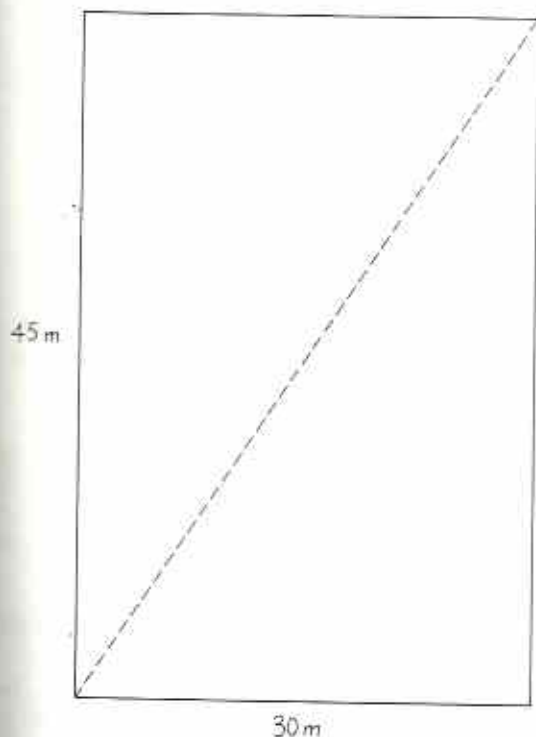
Plan of field Scale: 1 cm to 5 m
